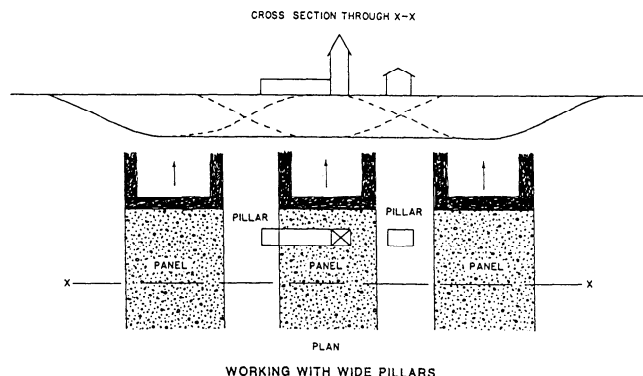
Use of sized pillars for protecting surface structures (Singh, 1985).
